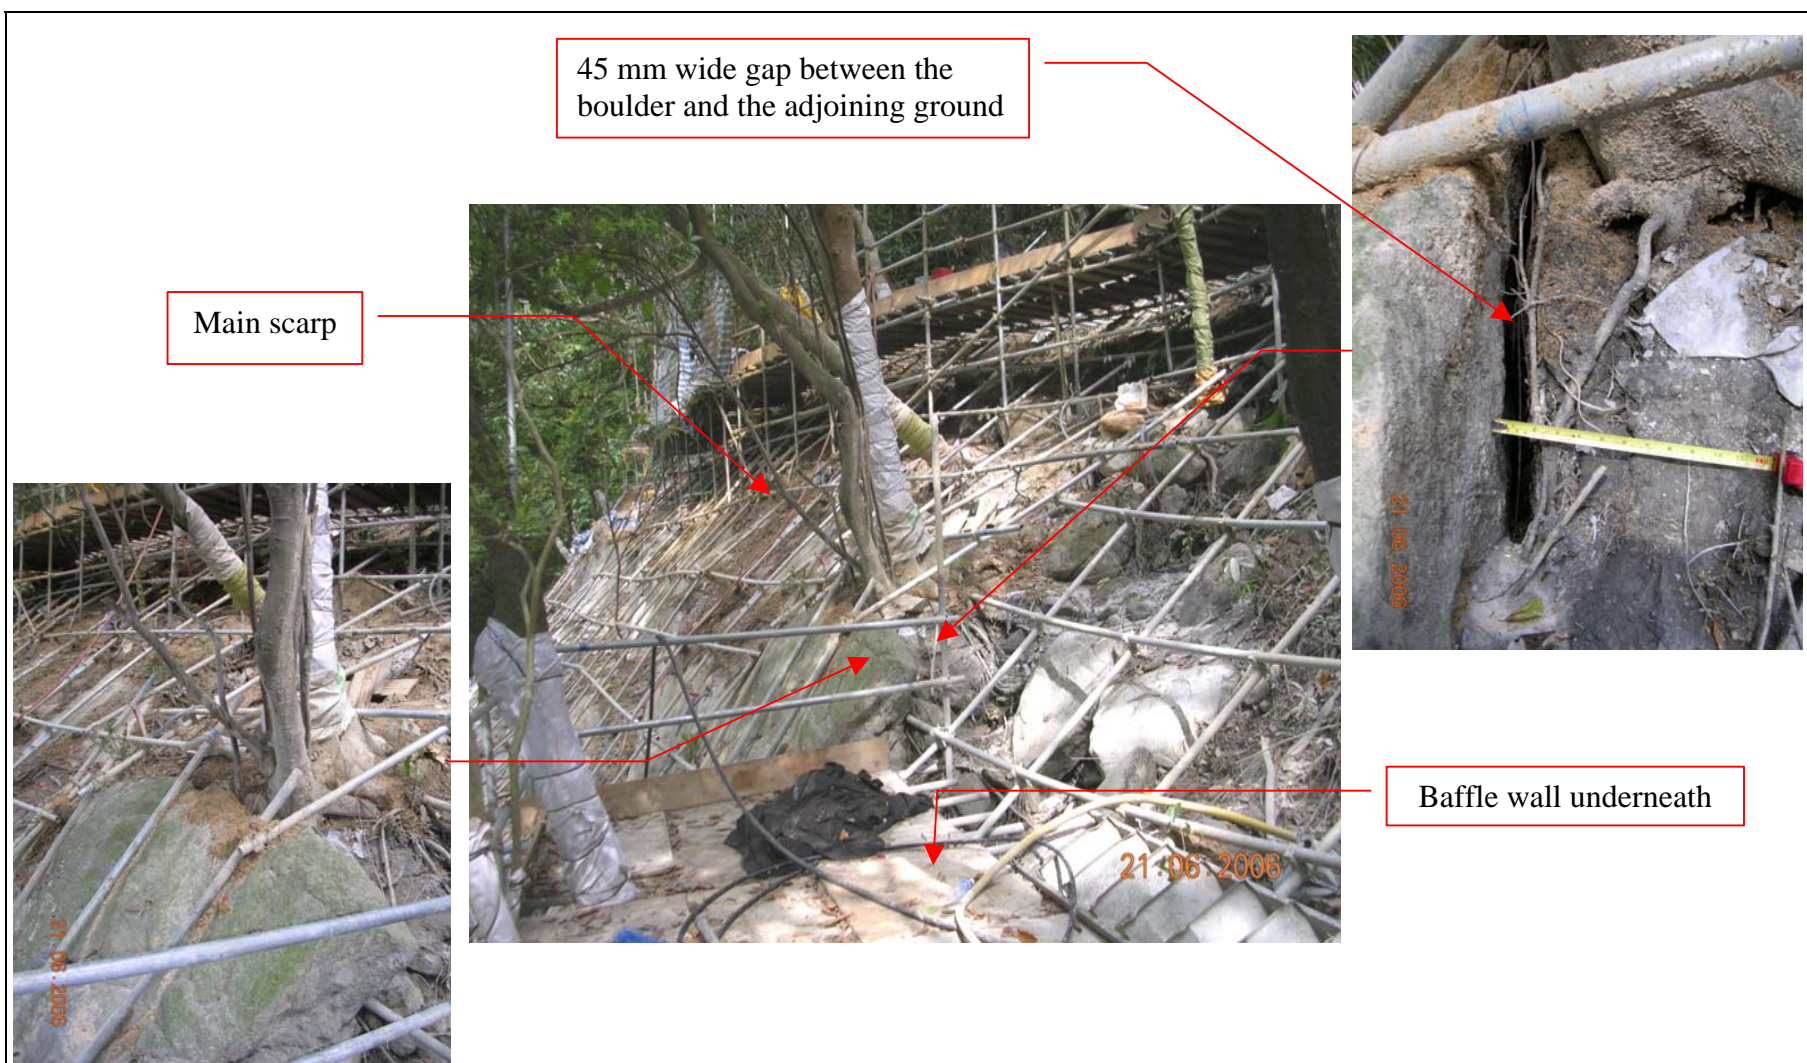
View of a Boulder Adjacent to the Baffle Wall (Photograph taken by FSW on 21 June 2006)
